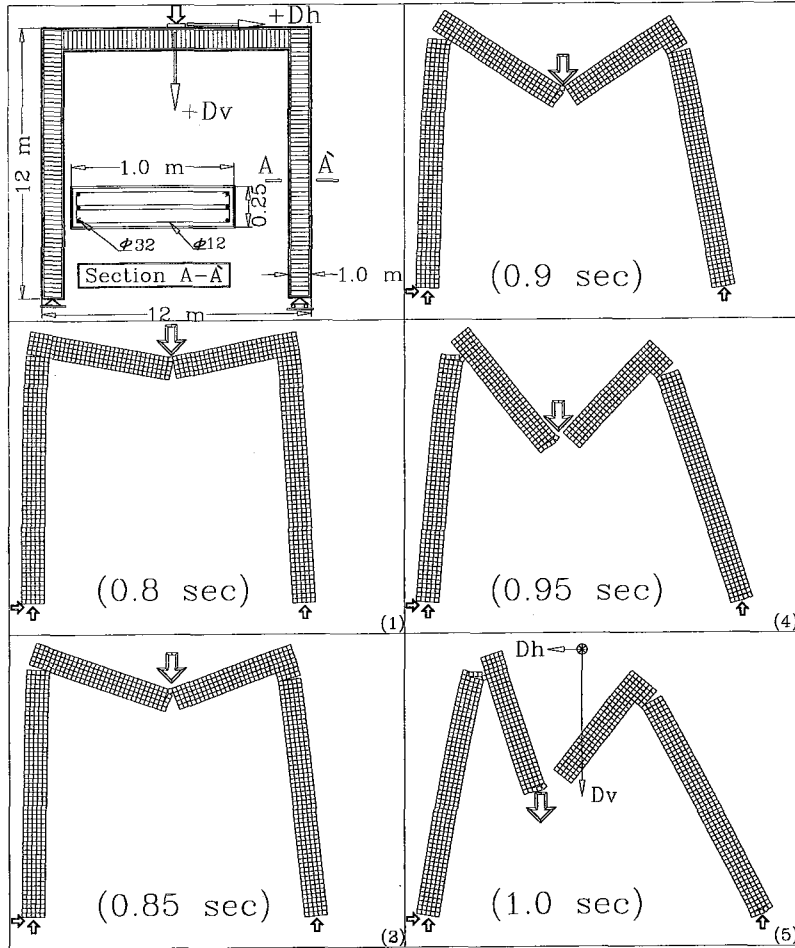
Deformed shape and failure pattern of a hinged-roller RC frame
